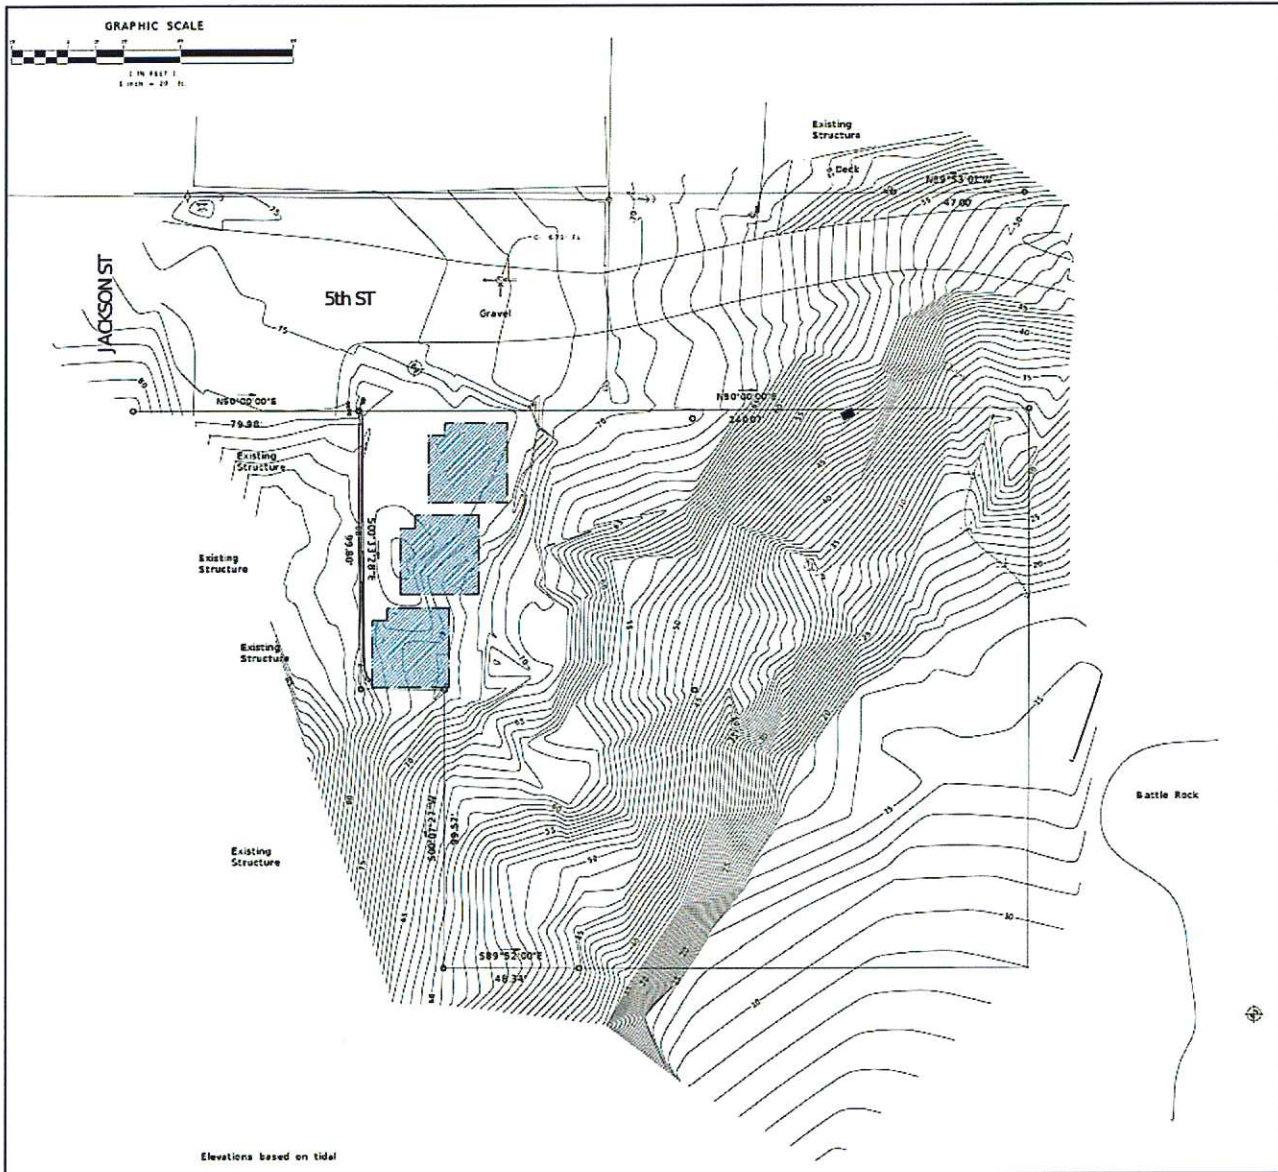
Project Topographic Map (provided by owner). See Figures 3A, B, and C additional topographic information about the site vicinity. The site elevation is just barely above 75 ft. The buildings will be connected by a hallway (not shown).
